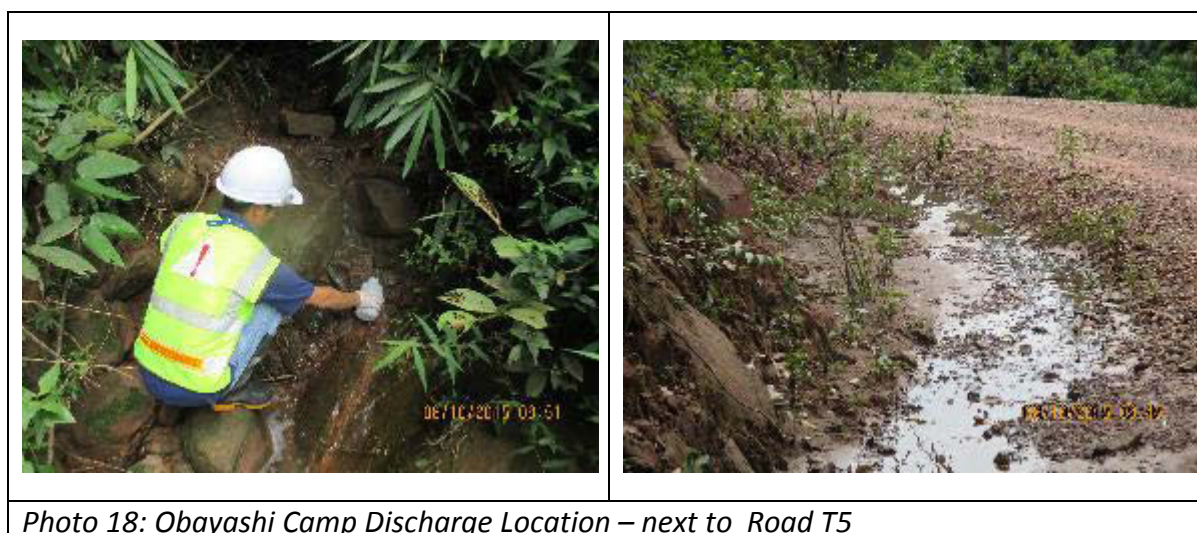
Obayashi Camp Discharge Location – next to Road T5
